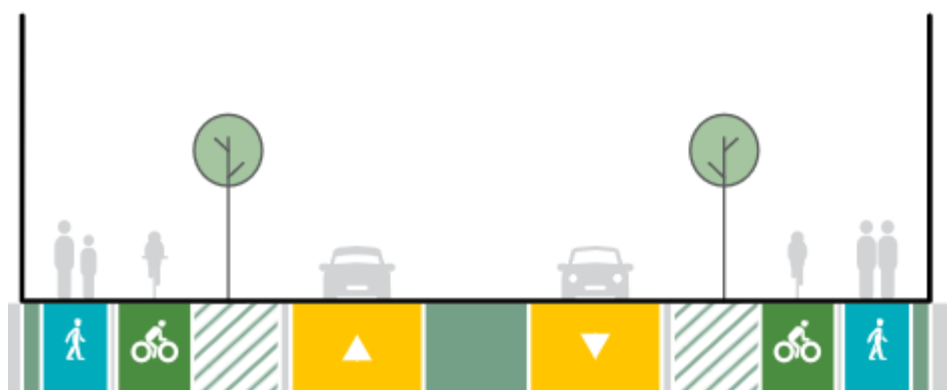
Coatesville-Riverhead Highway CFAF cross section outcome S1: SH16 to Short Road Indicative 24m cross section
